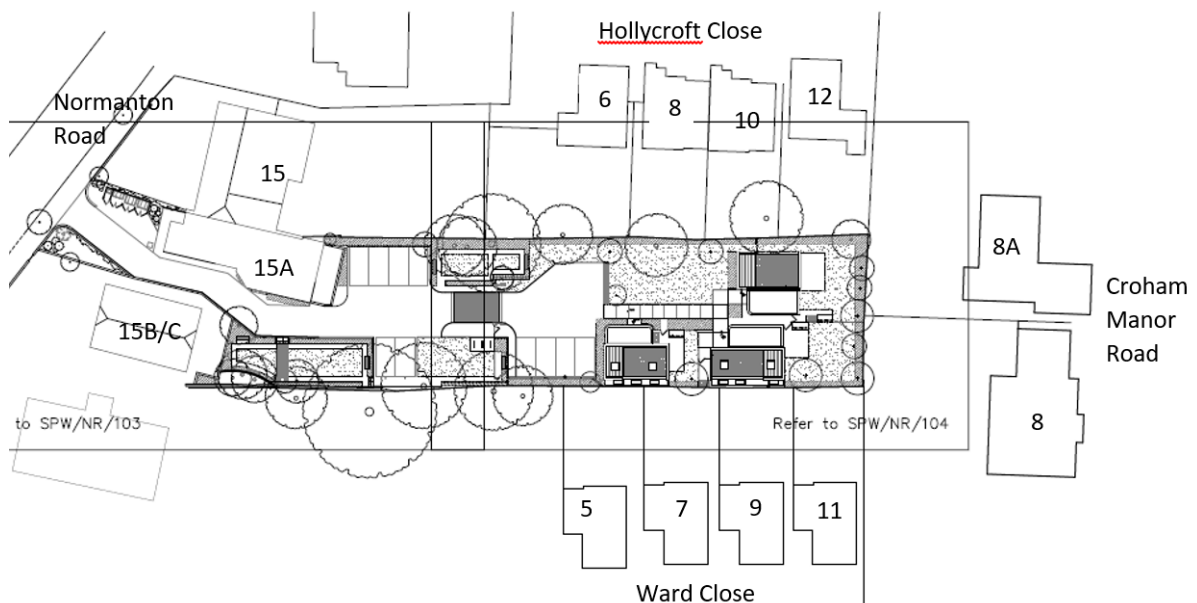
Proposed Block Plan highlighting the relationship with the adjoining occupiers.
